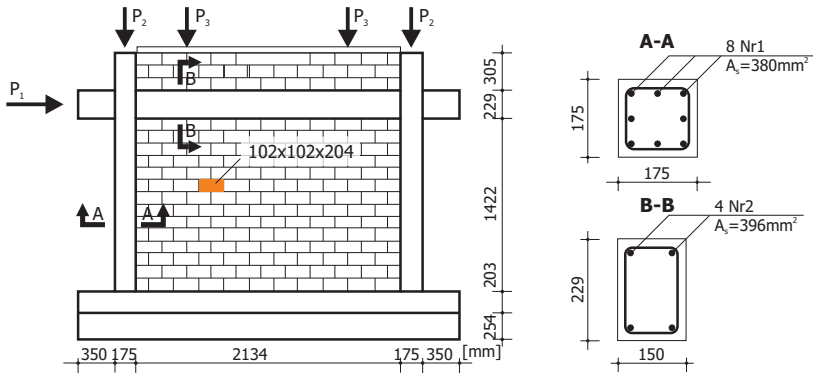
Geometry and loads for masonry infill wall tested in [45].
